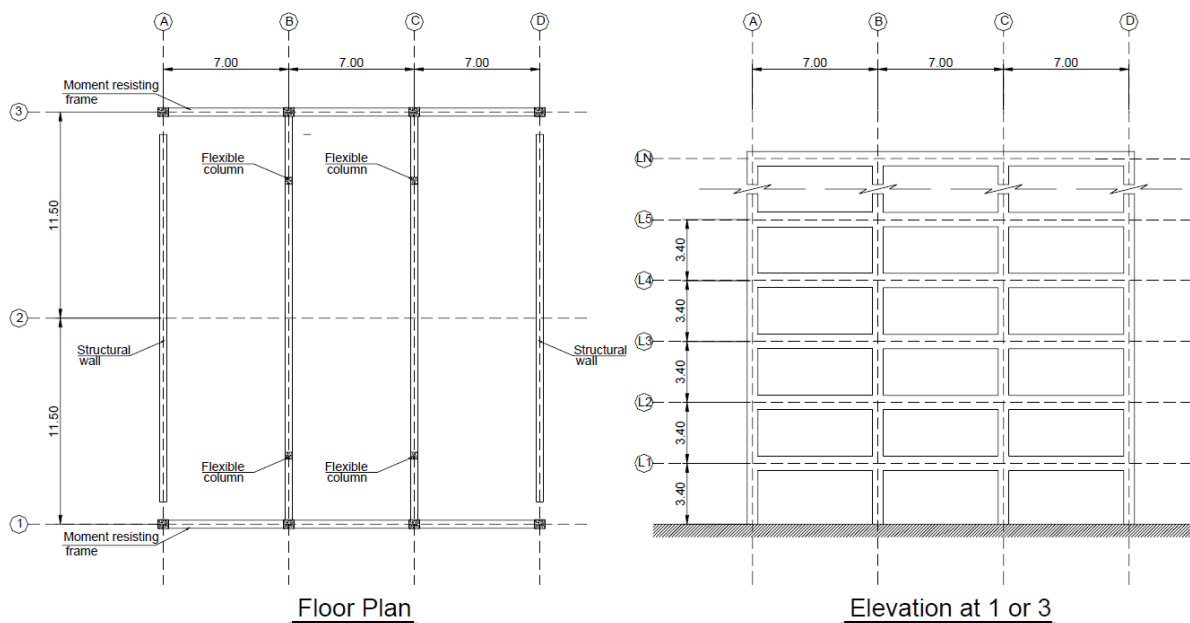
Floor plan and typical elevation (adopted from Ruiz, 2005).
